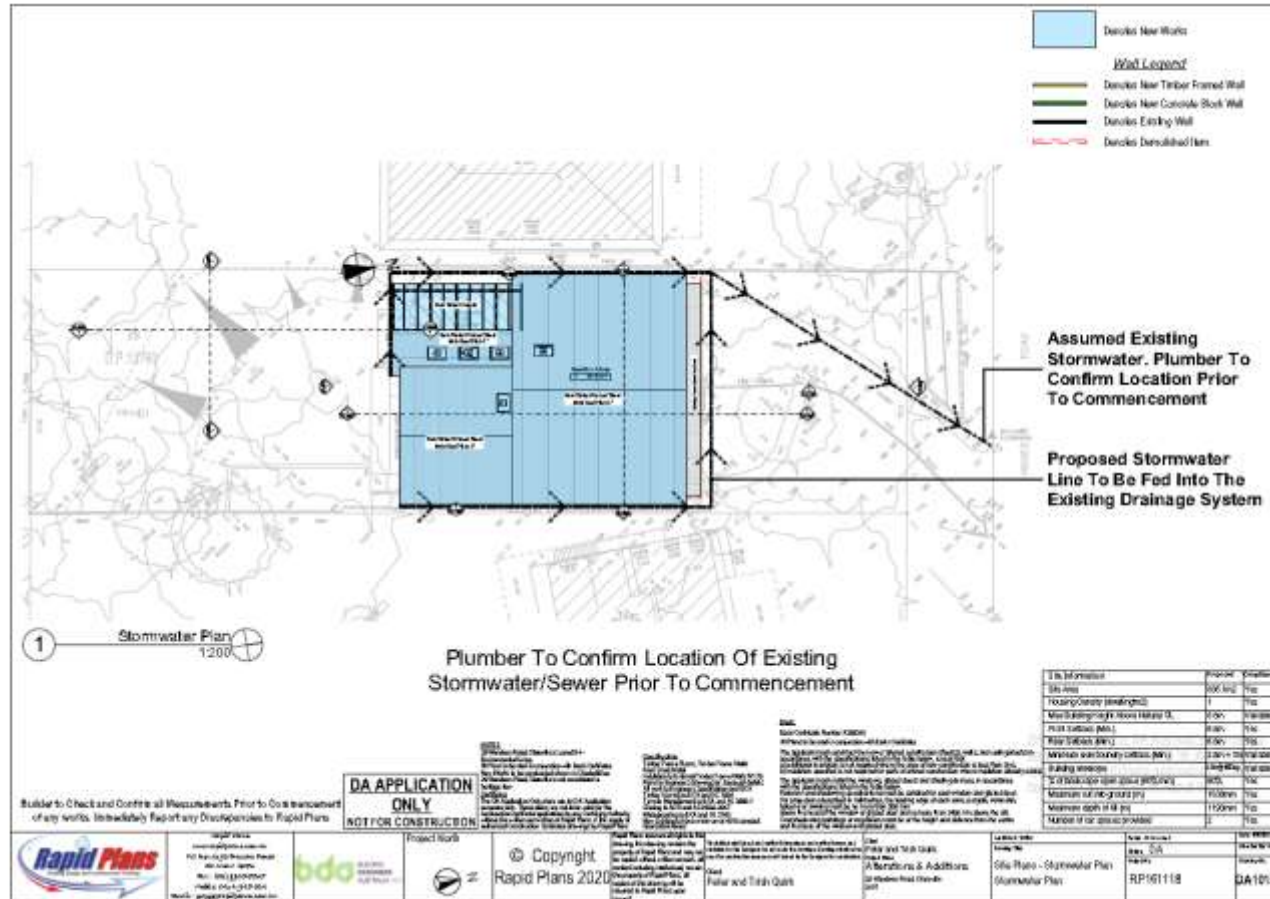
Illustrates the as proposed Storm Water Management Plan.
